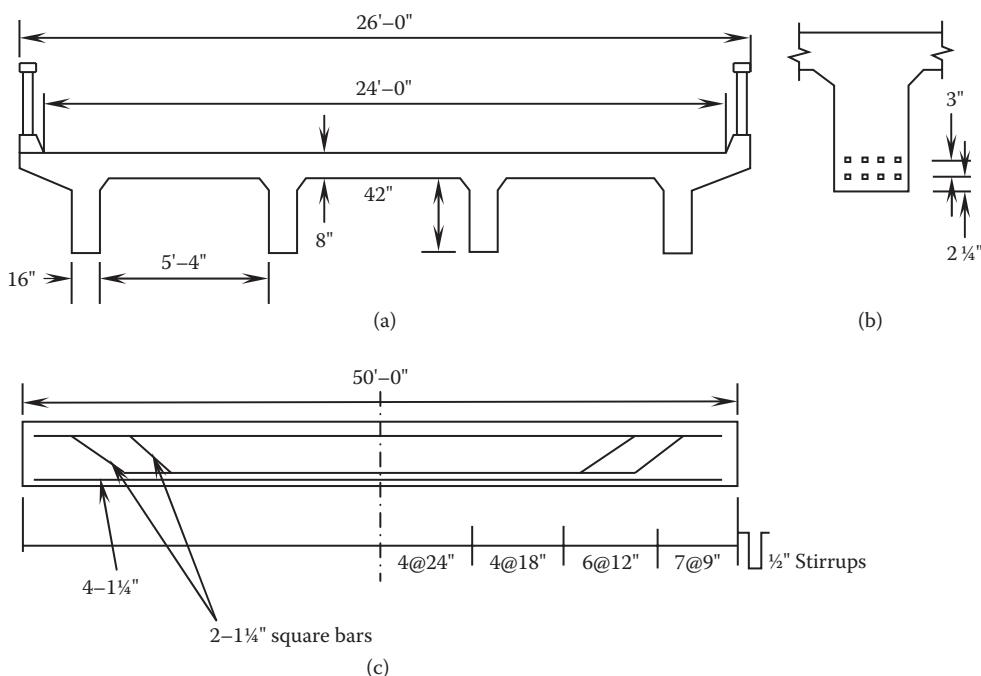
Details of simply supported T-beam concrete bridge example: (a) Typical cross section, (b) reinforcement locations, and (c) T-beam girder details.
